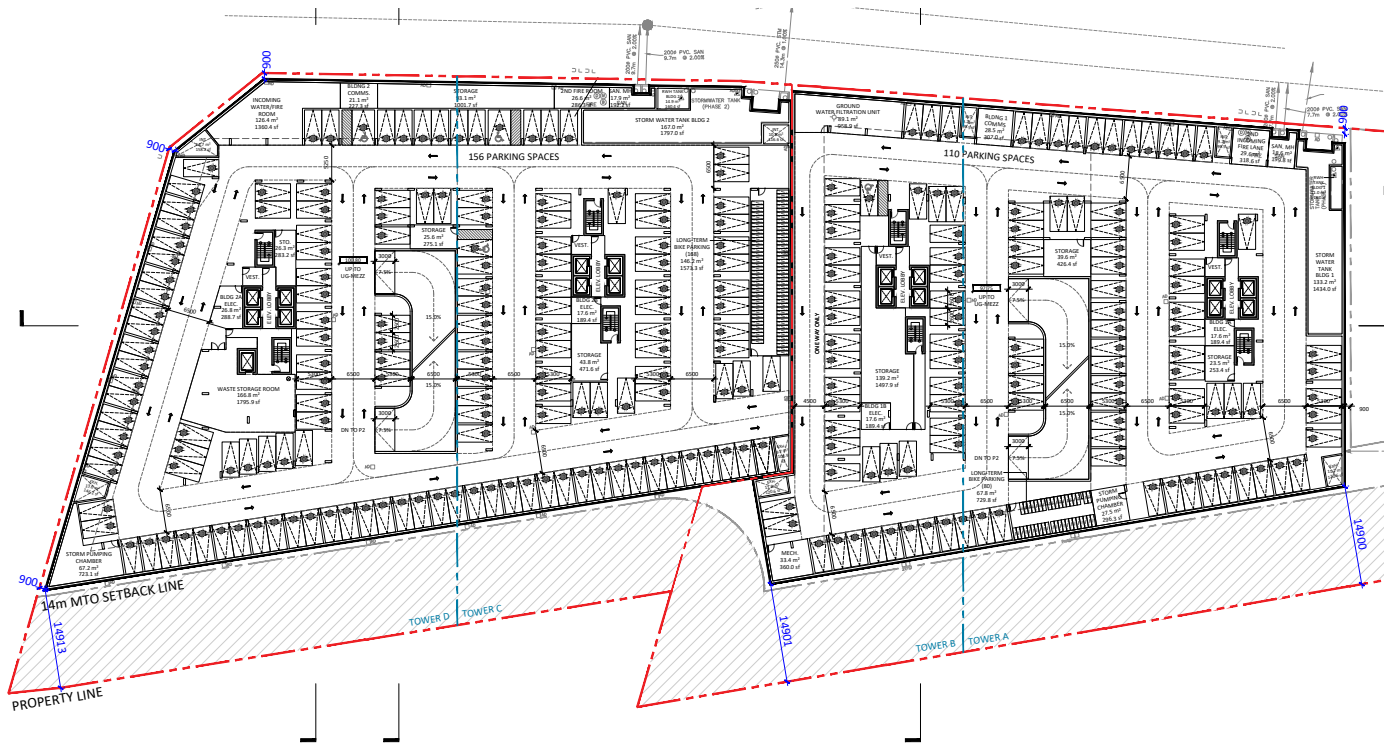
Typical Underground Parking Plan- P1 and P2
